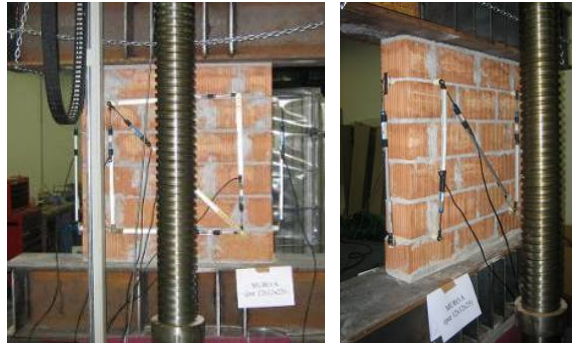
equipment for compression test parallel to holes on half-full brick walls (front and back view of the panel)
